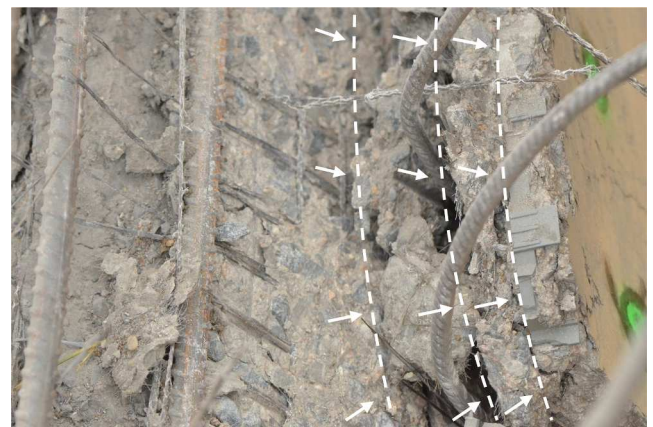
Multi-layer longitudinal cracking of specimen No. 18 along the basalt mesh and steel reinforcement.
